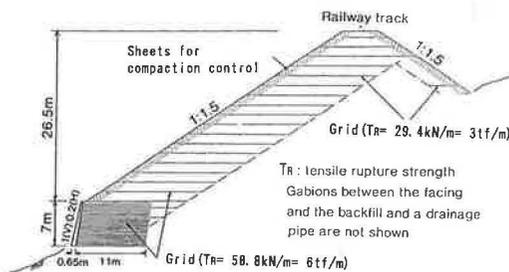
Cross-section typical of the reconstructed railway embankment at Aso site, damaged in 1989, the Ho-Hi Line (No.8 in Fig. 3)
